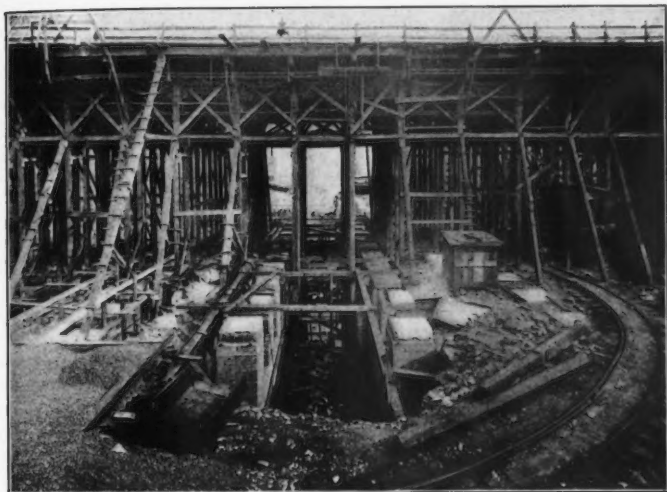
TEMPORARY BRIDGE, PERMANENT FOUNDATIONS, AND TRUCKING SUBWAY, EIGHTH AVENUE.
